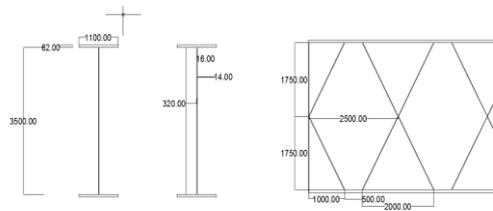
Cross section of the plate girder with hexagonal stiffener arrangement
